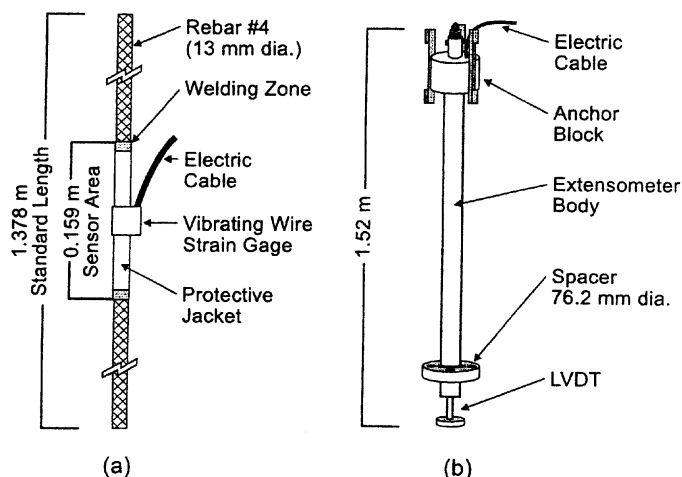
Pile Instrumentation: (a) Sister Bars; (b) Removable Extensometers
